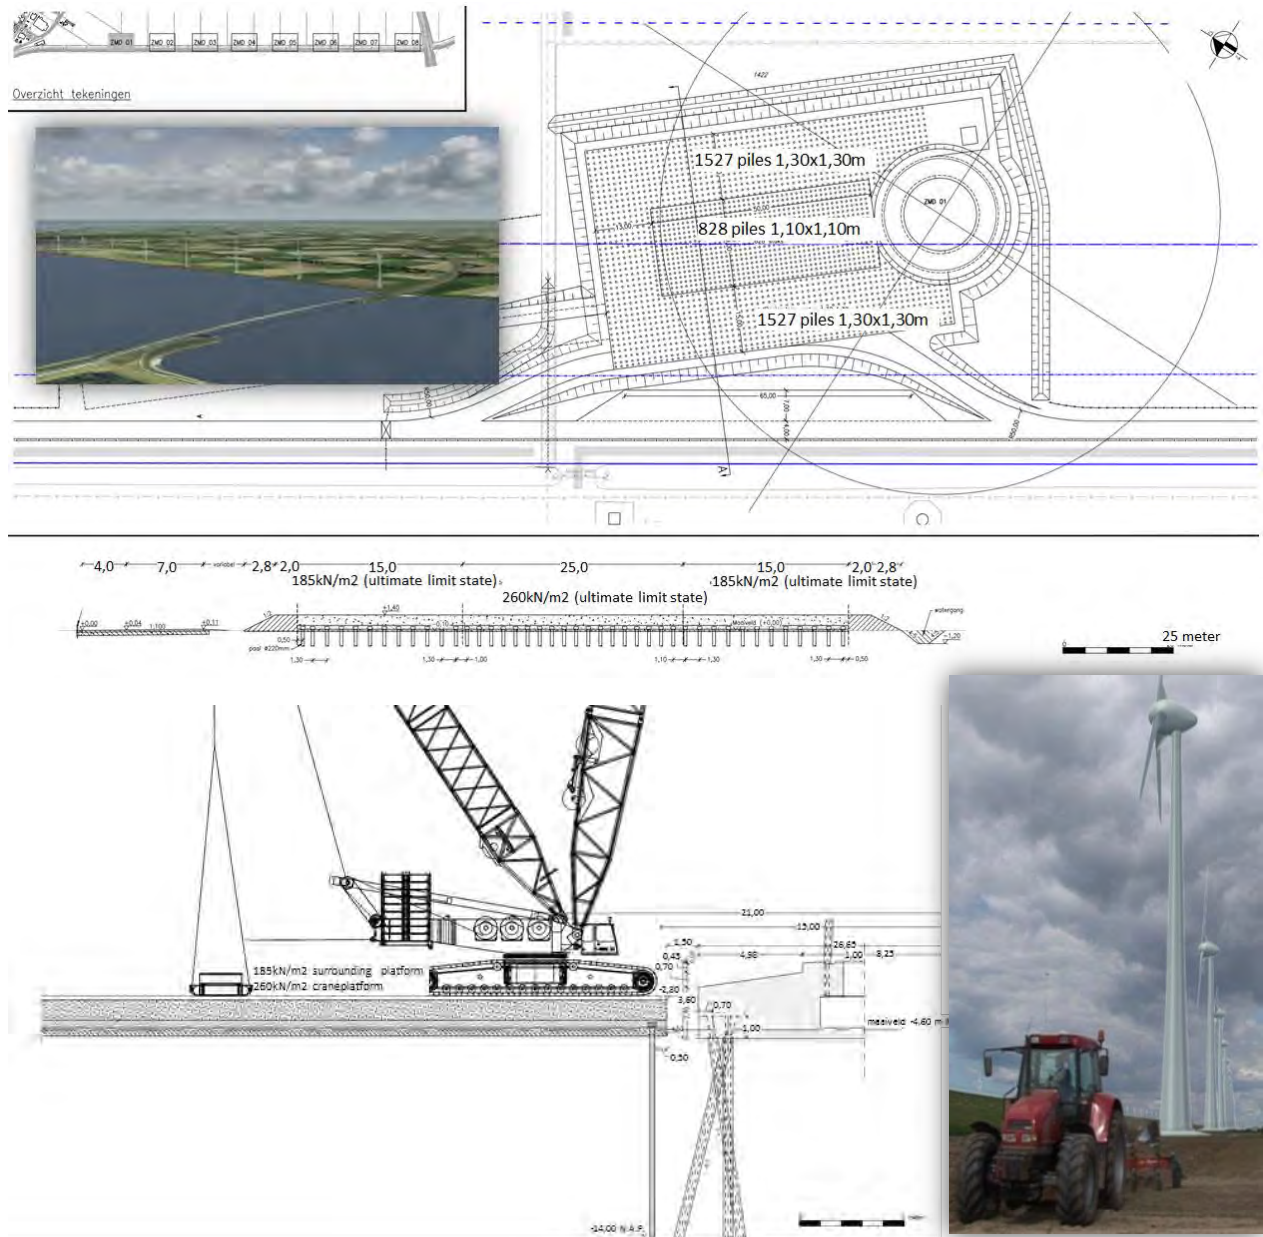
Two cross sections and plan view of wind mill construction LTP (and interaction with mill foundation)
